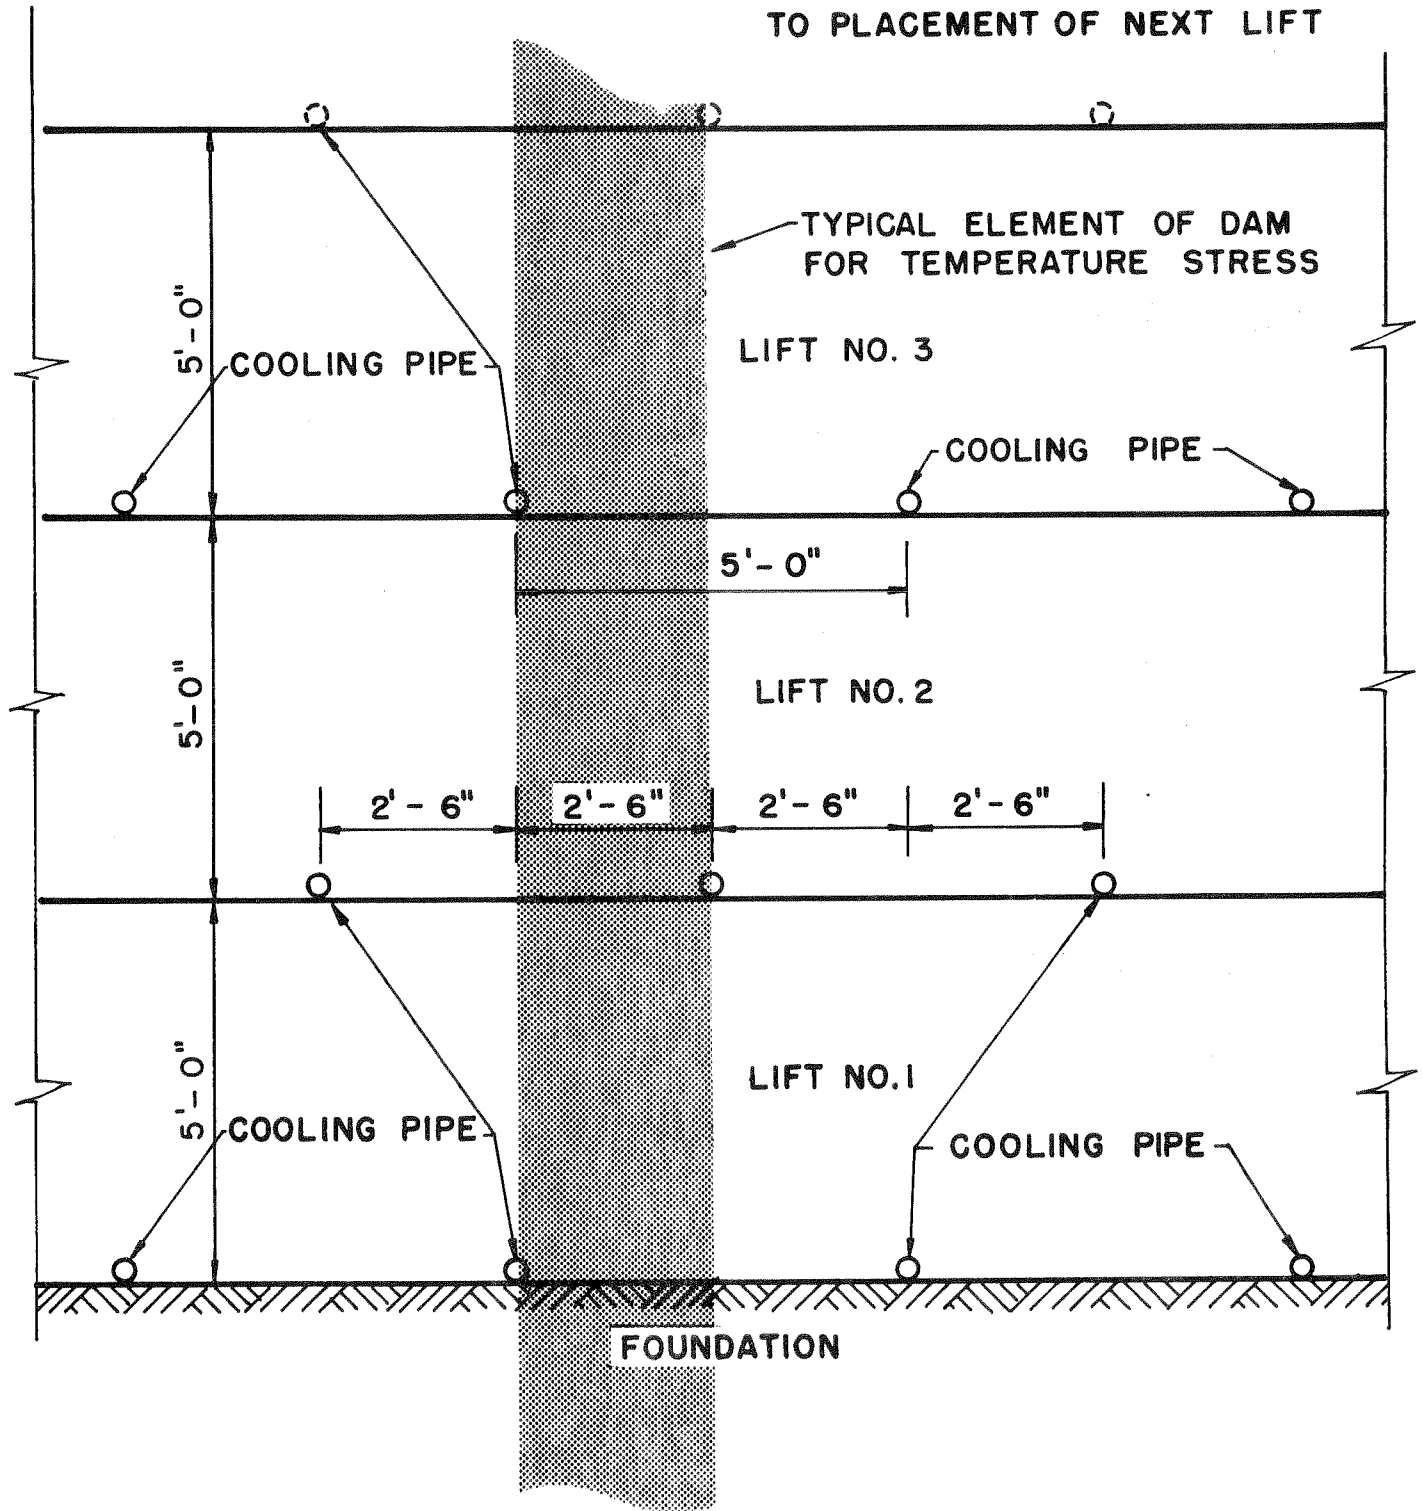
TYPICAL ARRANGEMENT OF COOLING PIPES
